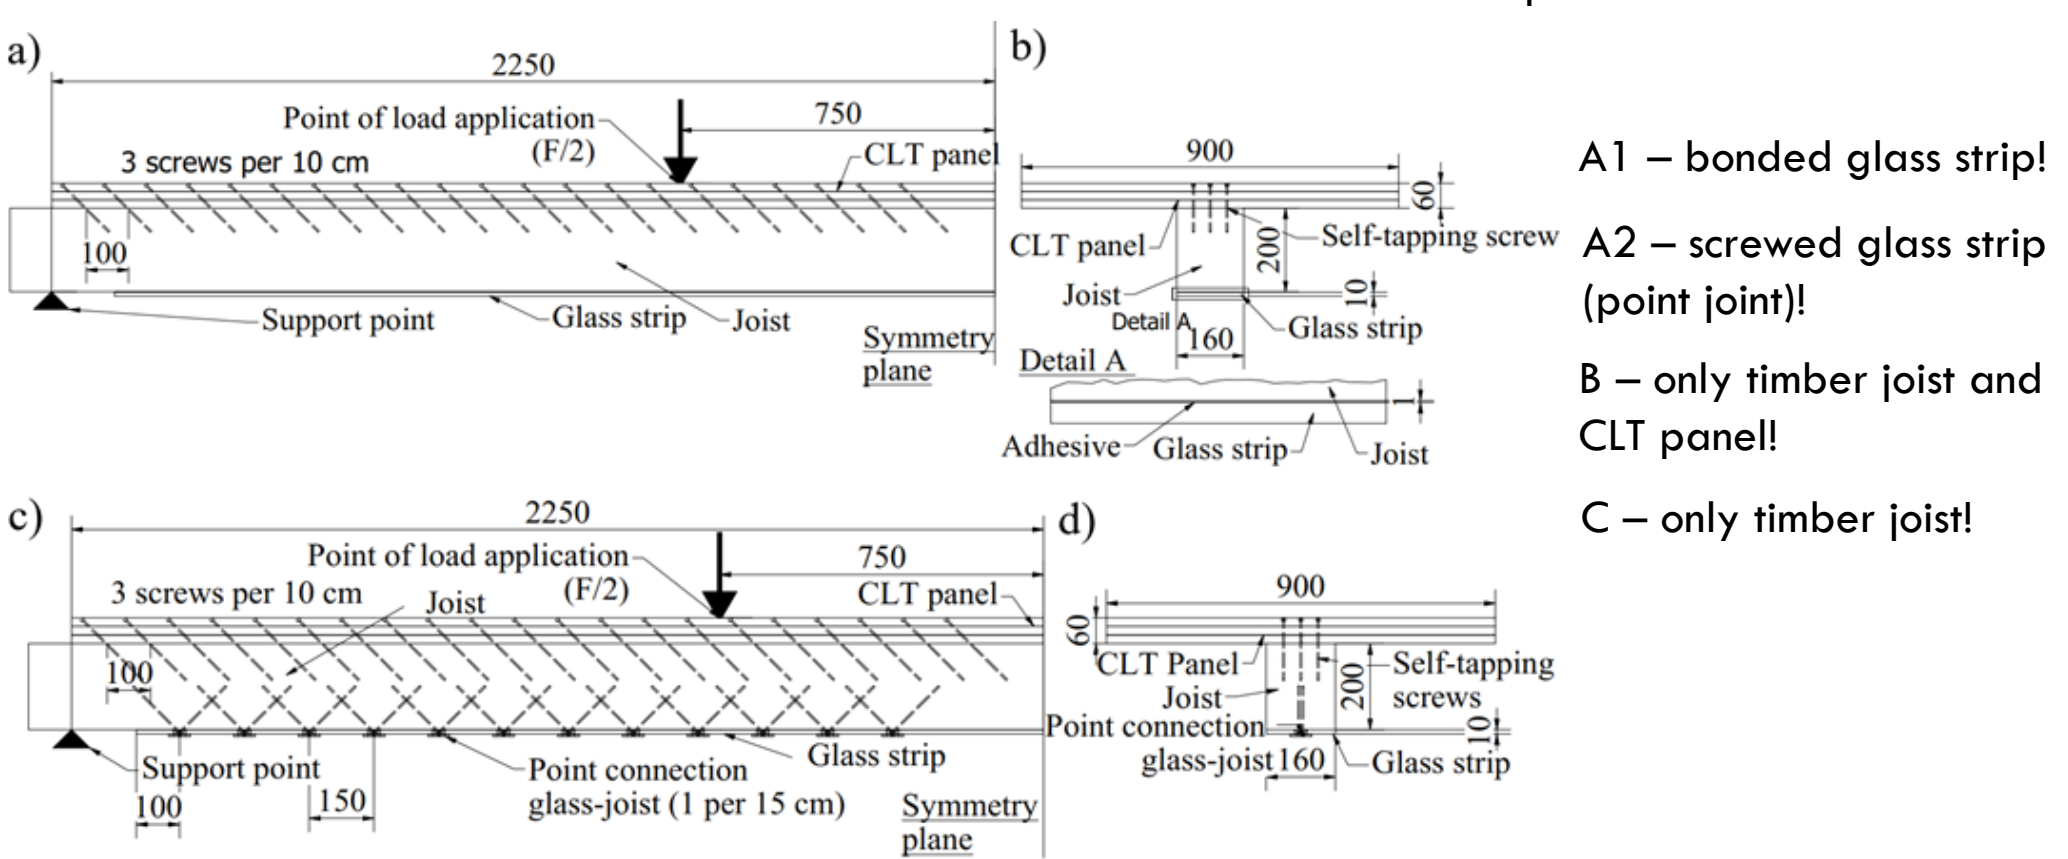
a) Configuration A1 – longitudinal section; b) configuration A1 – cross-section; c) configuration A2 – longitudinal section; d) configuration A2 – cross-section
